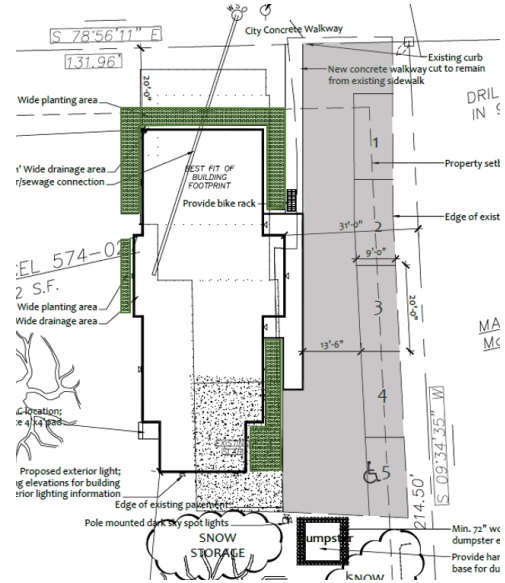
Excerpt from the site plan submitted by the Applicant which shows the proposed landscaping beds, shaded in green.
